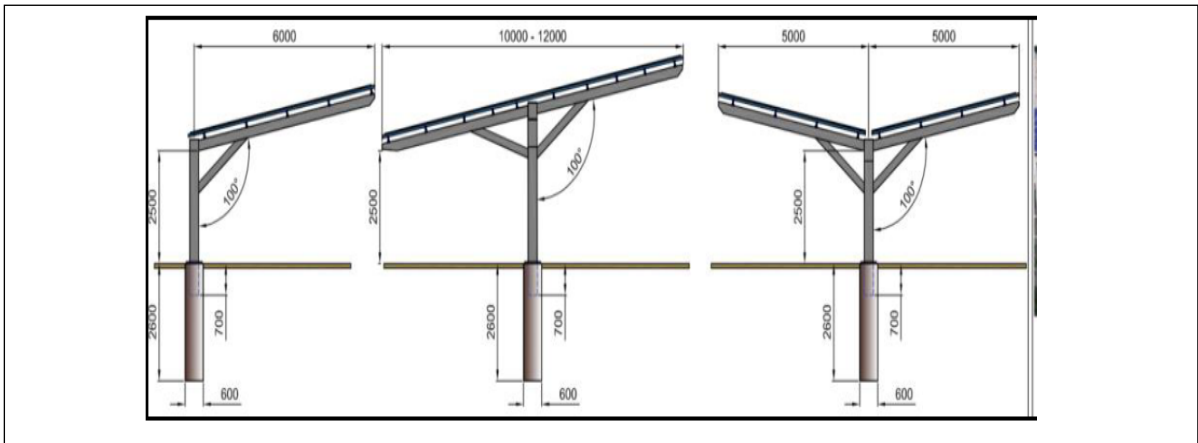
| Elevation of proposed rooftop solar PV structures (Source: SSD-10353-Mod-3 Solar Report)
